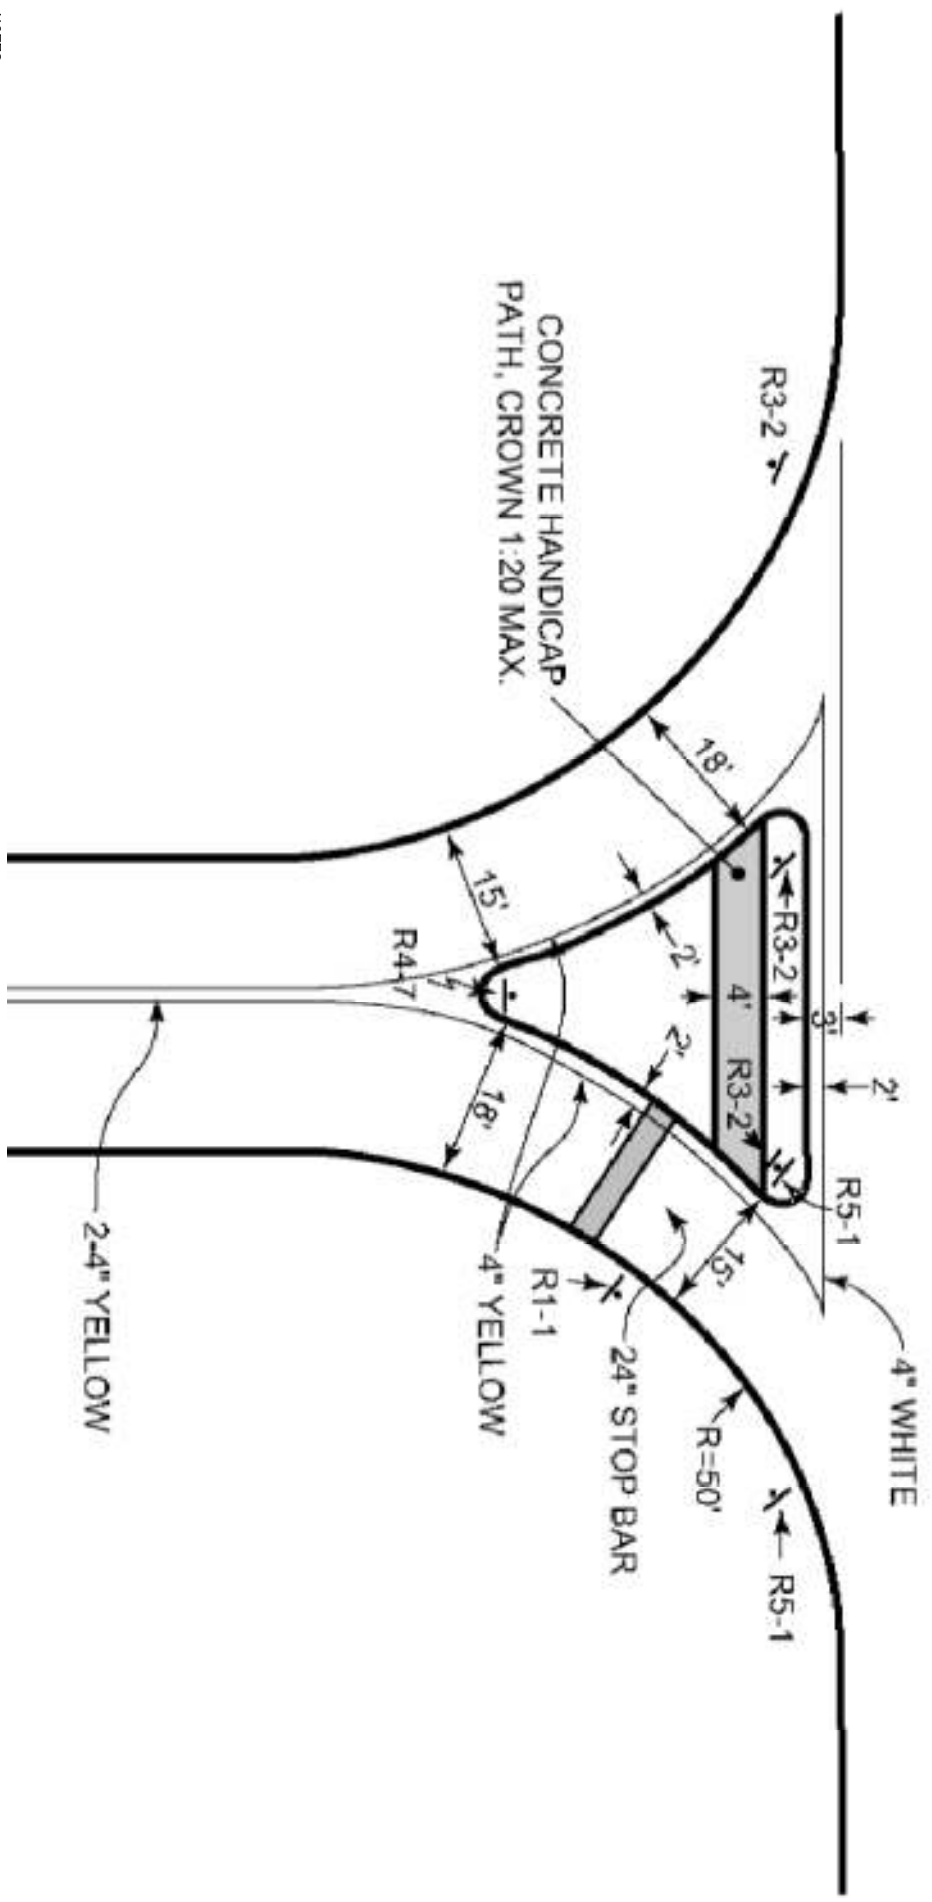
STANDARD PAVEMENT MARKING LEGEND
